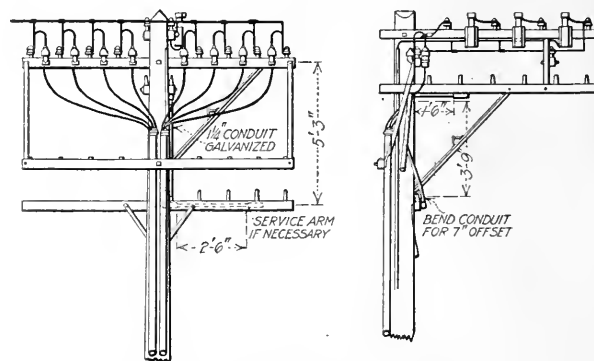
STANDARD CABLE-POLE CONSTRUCTION ADOPTED
